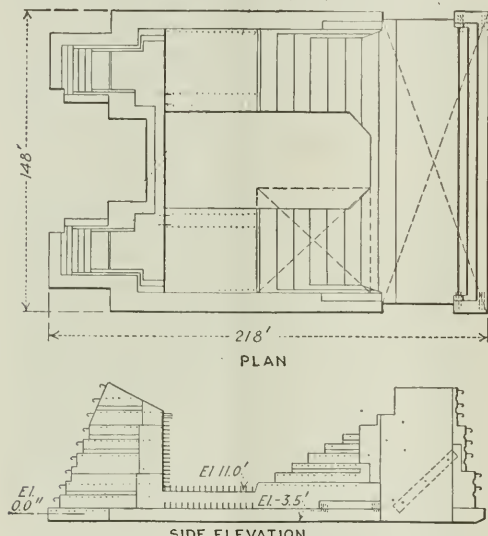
PLAN AND ELEVATION OF ANCHORAGE SUPERSTRUCTURE
